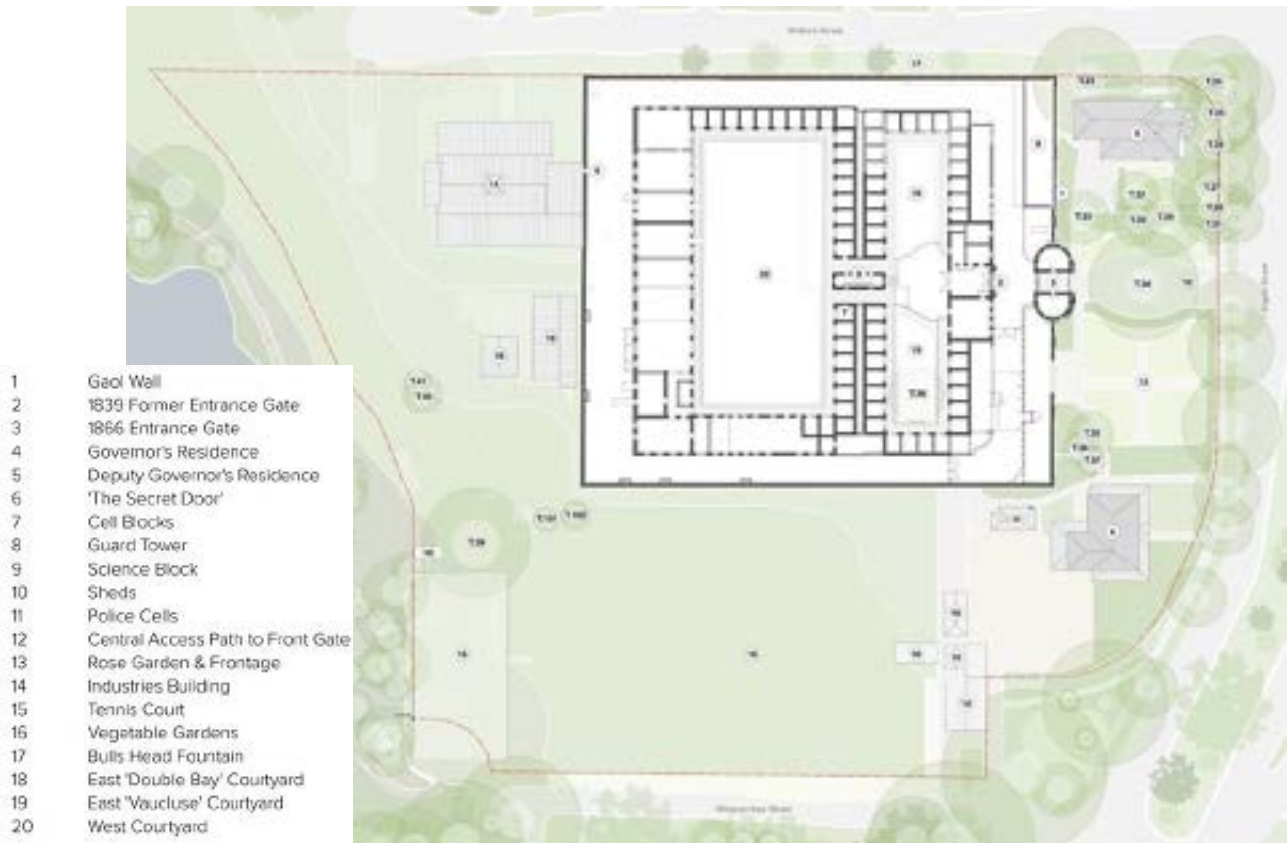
Extract of proposed drawings - Existing Site Plan (DA-050-000)
